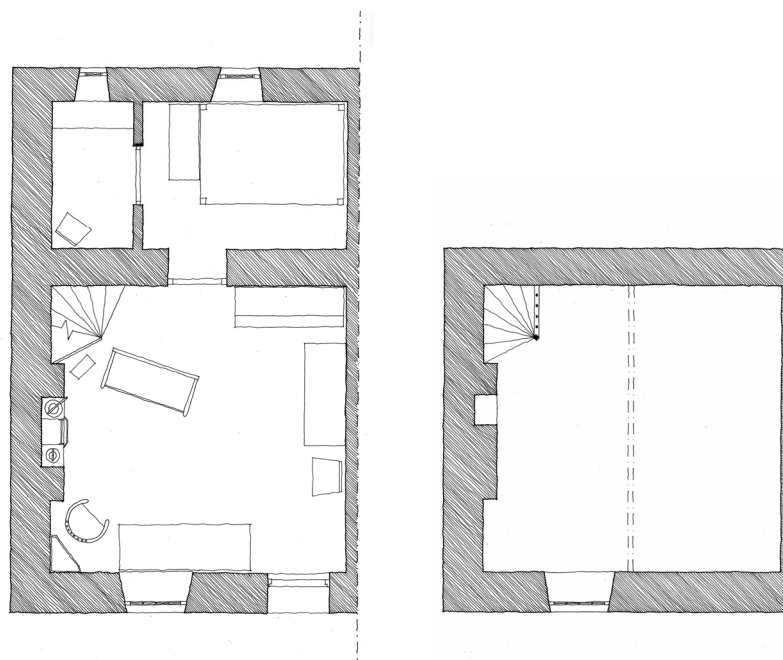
Lower and upper floor plans showing use of space and layout of the furniture at no.17 Rhydycar 1:100
